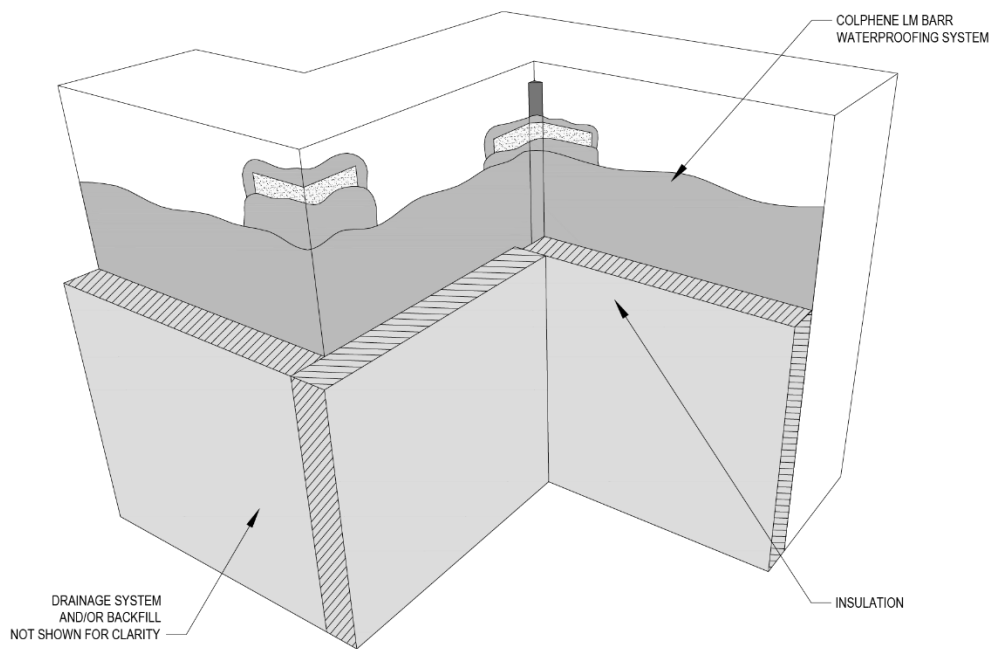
Extruded Polystyrene Protection Course At Inside/Outside Corners
